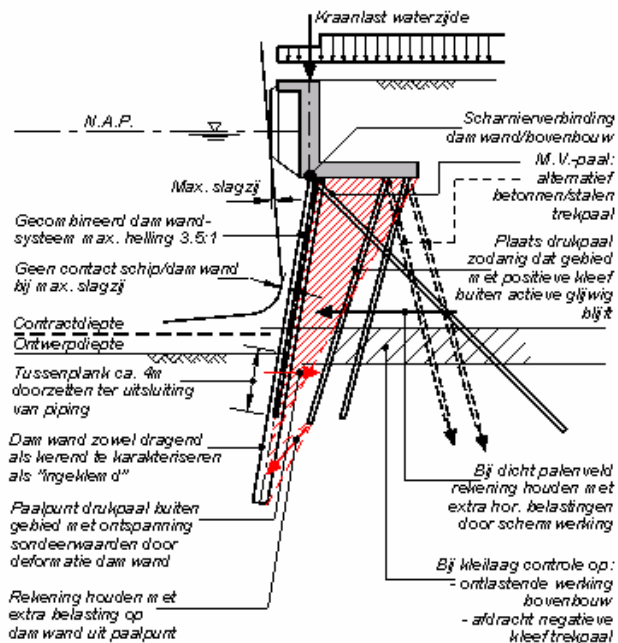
Aspects to be considered of quaywall with relieving floor.
